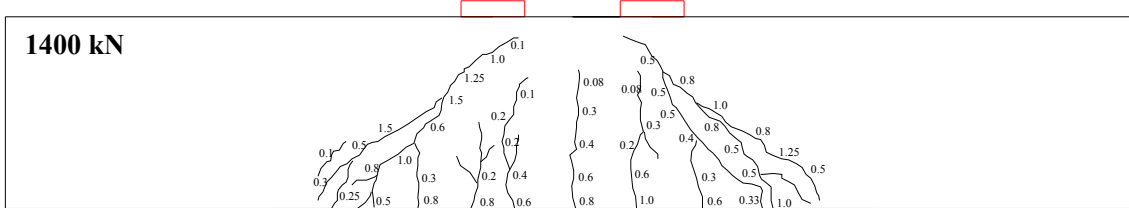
Crack patterns at 1400 kN of specimen MW1-2
